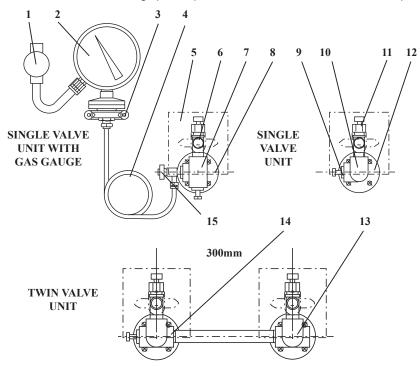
A HEADER MANIFOLDS — MULTI-DEMAND VALVE
